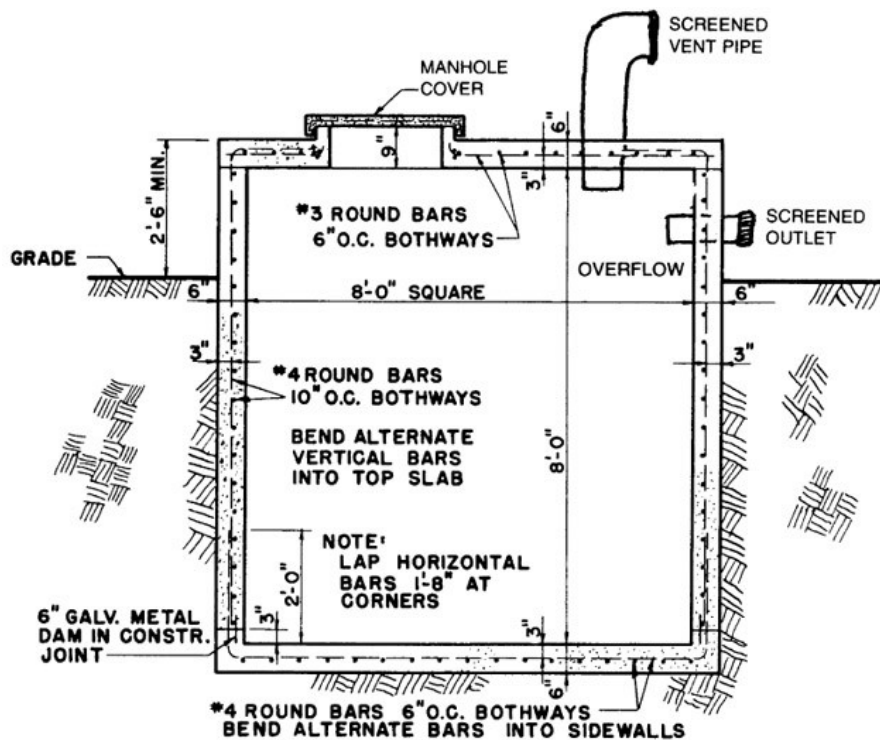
Cross section of 8' x 8' cistern showing overflow pipe, manhole, and vent pipe.
